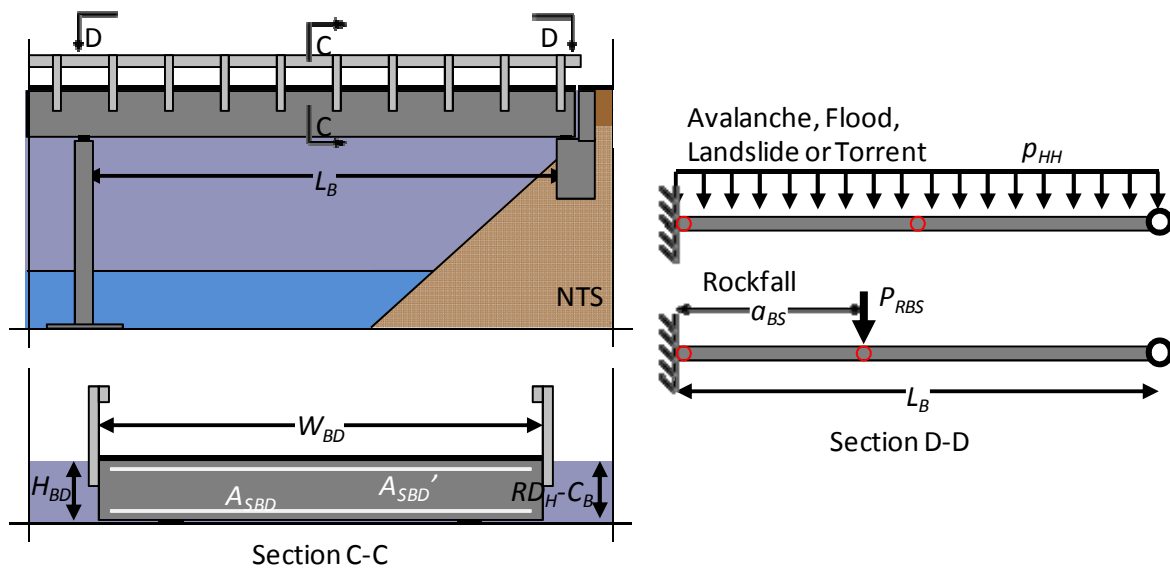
Bridge superstructure horizontal loading and potential flexural hinge locations.
